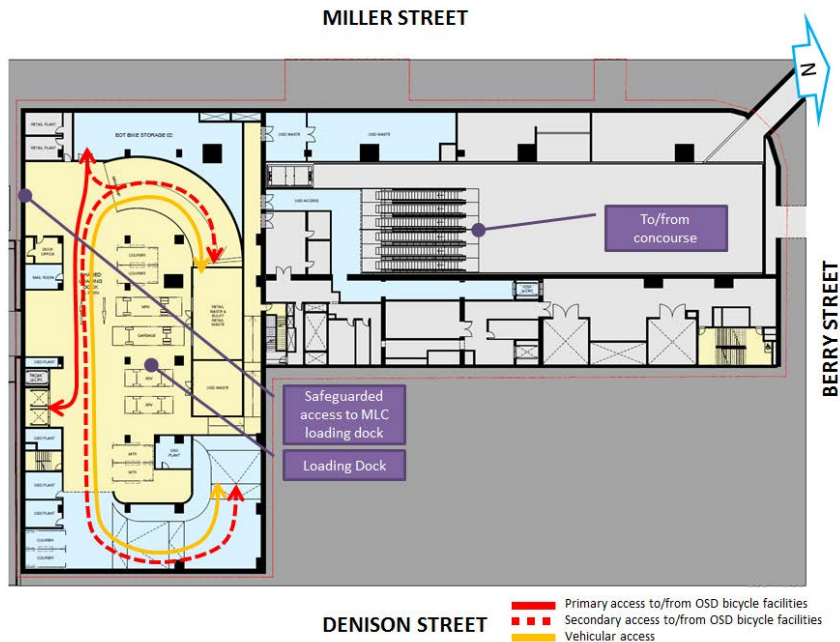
Basement Level 1 – Loading Dock and Bike Parking Facilities
